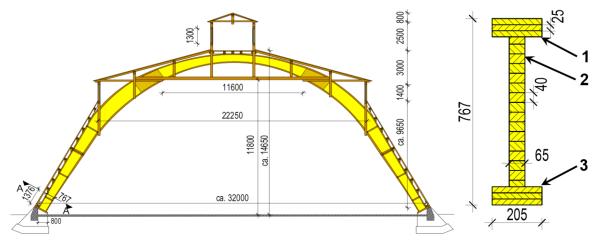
left: view on the truss construction; right: sectional view A-A-1: top chord; 2: web; 3: bottom chord (all dimensions in mm)
